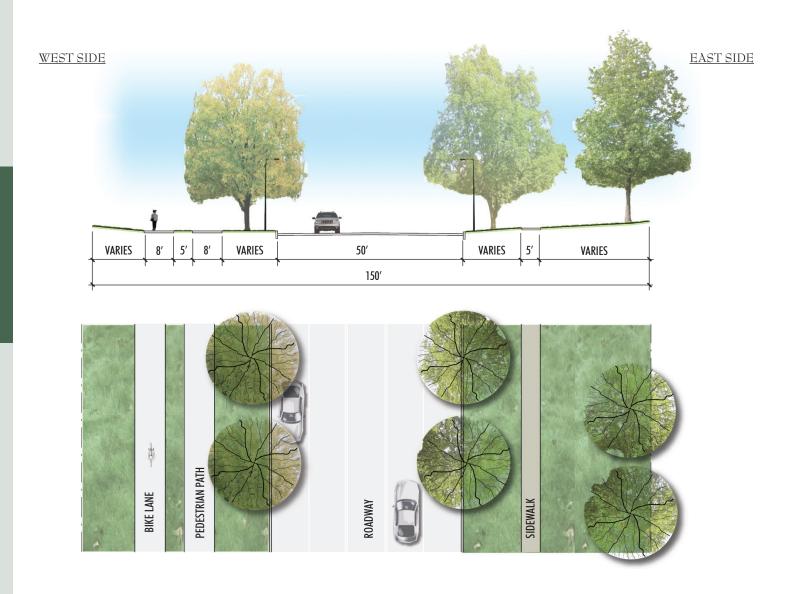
Southern Parkway: Zone 2 Existing Conditions Section and Plan (at I-264)
